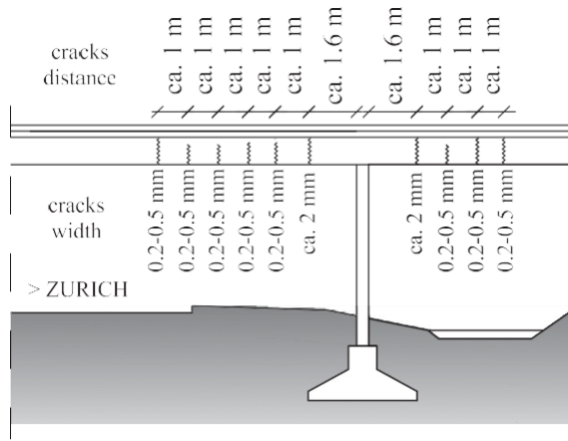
Cracks in the bridge girder after lowering the pier at 44 m (adapted from [36]).
